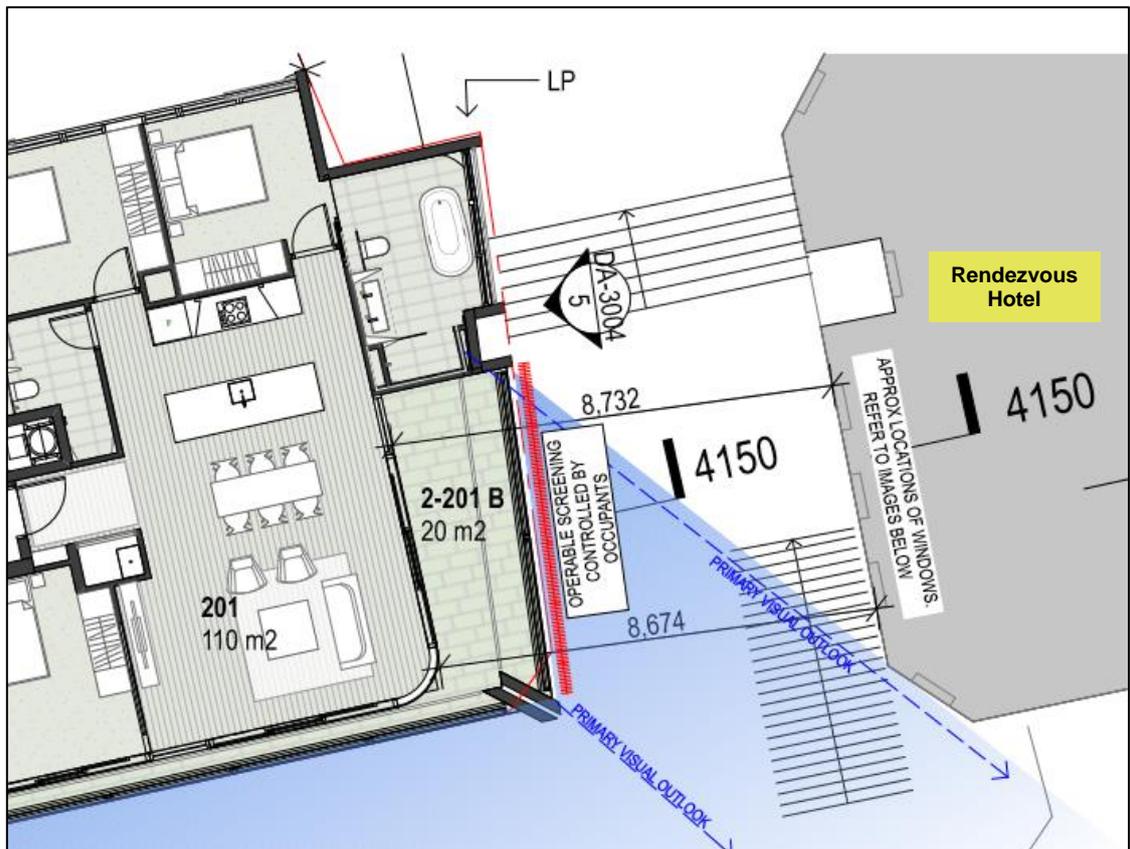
View angles and proposed screening on level 2 (northern elevation) of Building 2 (Source: Applicant's RRTS)
